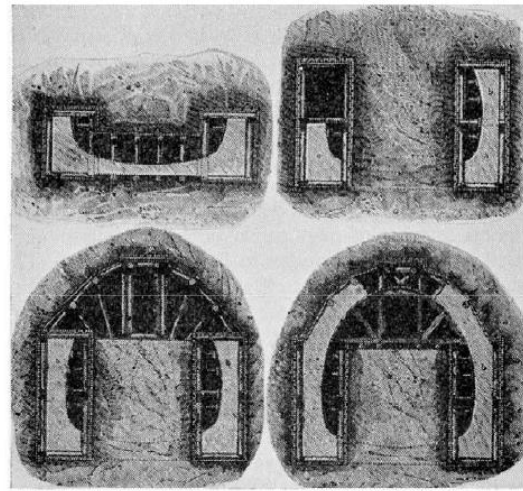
The Königsdorf Tunnel on the Dresden–Leipzig line was driven in 1837. In this tunnel the foundation for the lining was placed first, after which the masonry lining was put in. With the lining in place the central core was removed.
